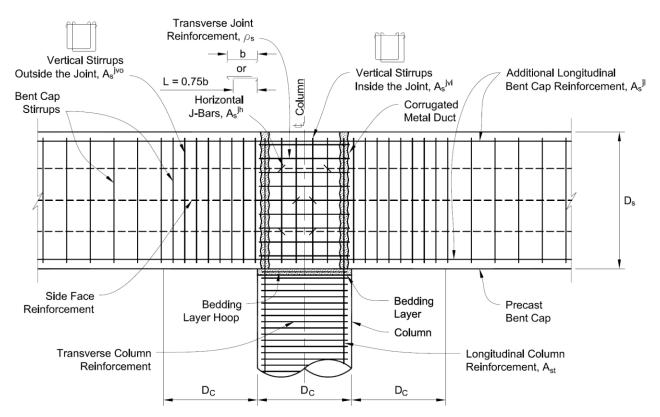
Grouted Duct Full Ductility Joint Shear Reinforcement Details (Elevation)—SDCs C and D
